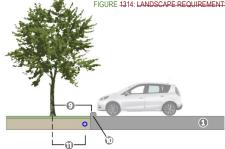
LANDSCAPE REQUIREMENTSTREE PLANTING REQUIREMENTS
